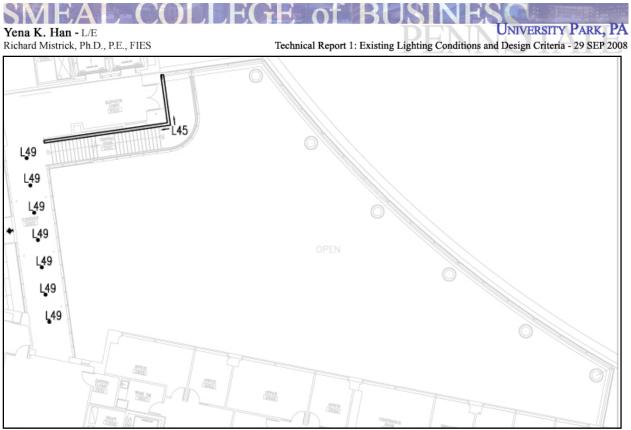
Atrium Lighting Plan, Second and Third Floors
